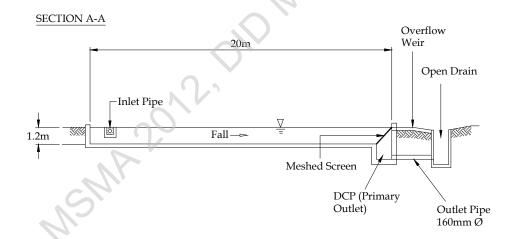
B2.2: Typical Detail Drawing for Above-Ground Tank
